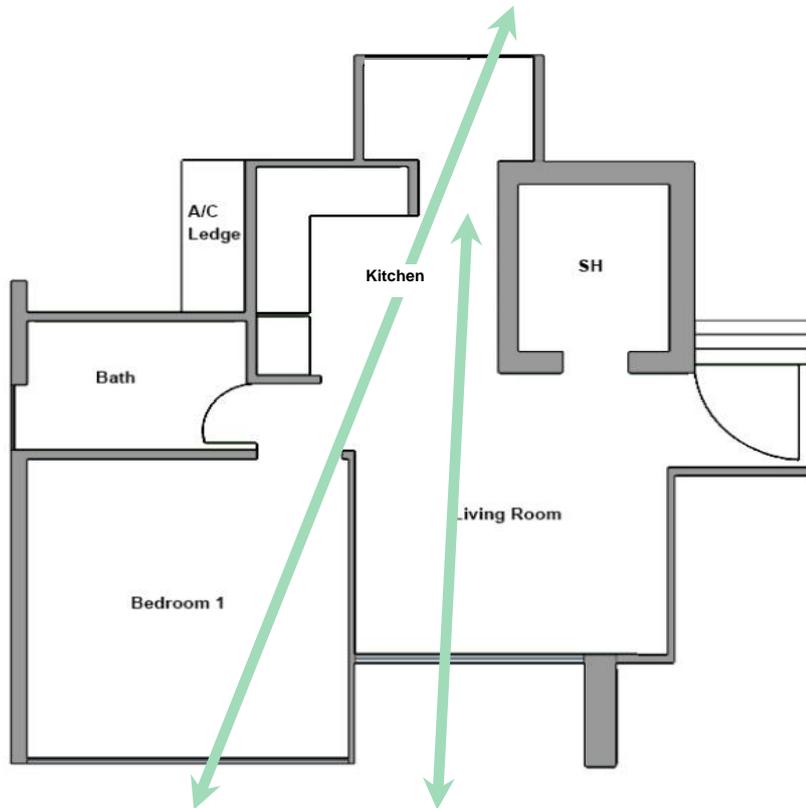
Dwelling unit layout with living room and bedroom 1 with good cross ventilation and meet the requirement.
